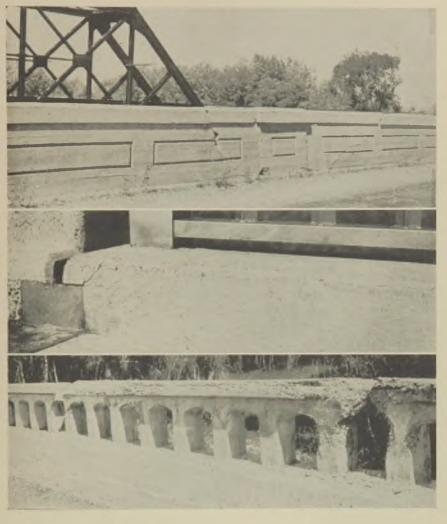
(top) – Type 1 deterioration. Structural damage due to colliding vehicle. Concrete sound. Bridge built in 1921, photographed in 1944.
